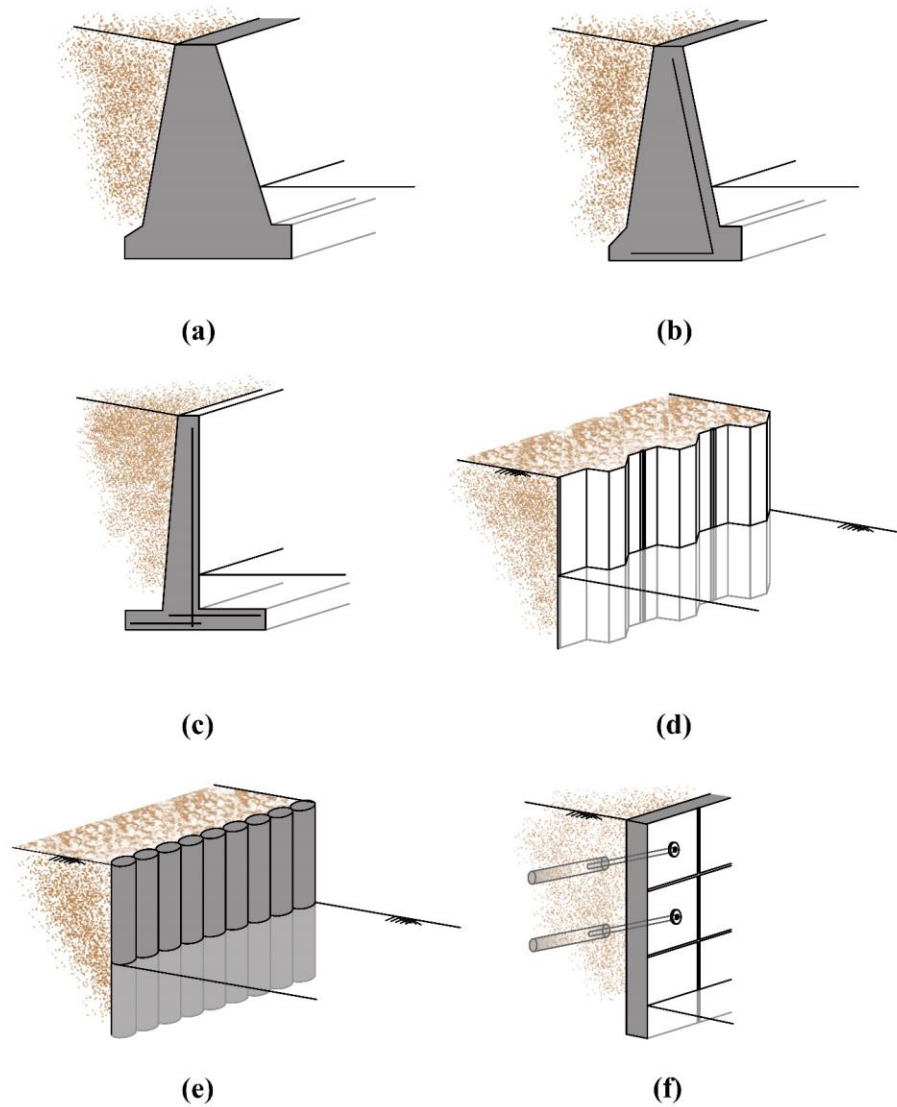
Different types of rigid retaining walls: (a) Gravity wall; (b) Semi gravity walls; (c) Cantilevered wall; (d) Sheet pile; (e) Bored pile; (f) Anchored walls.
